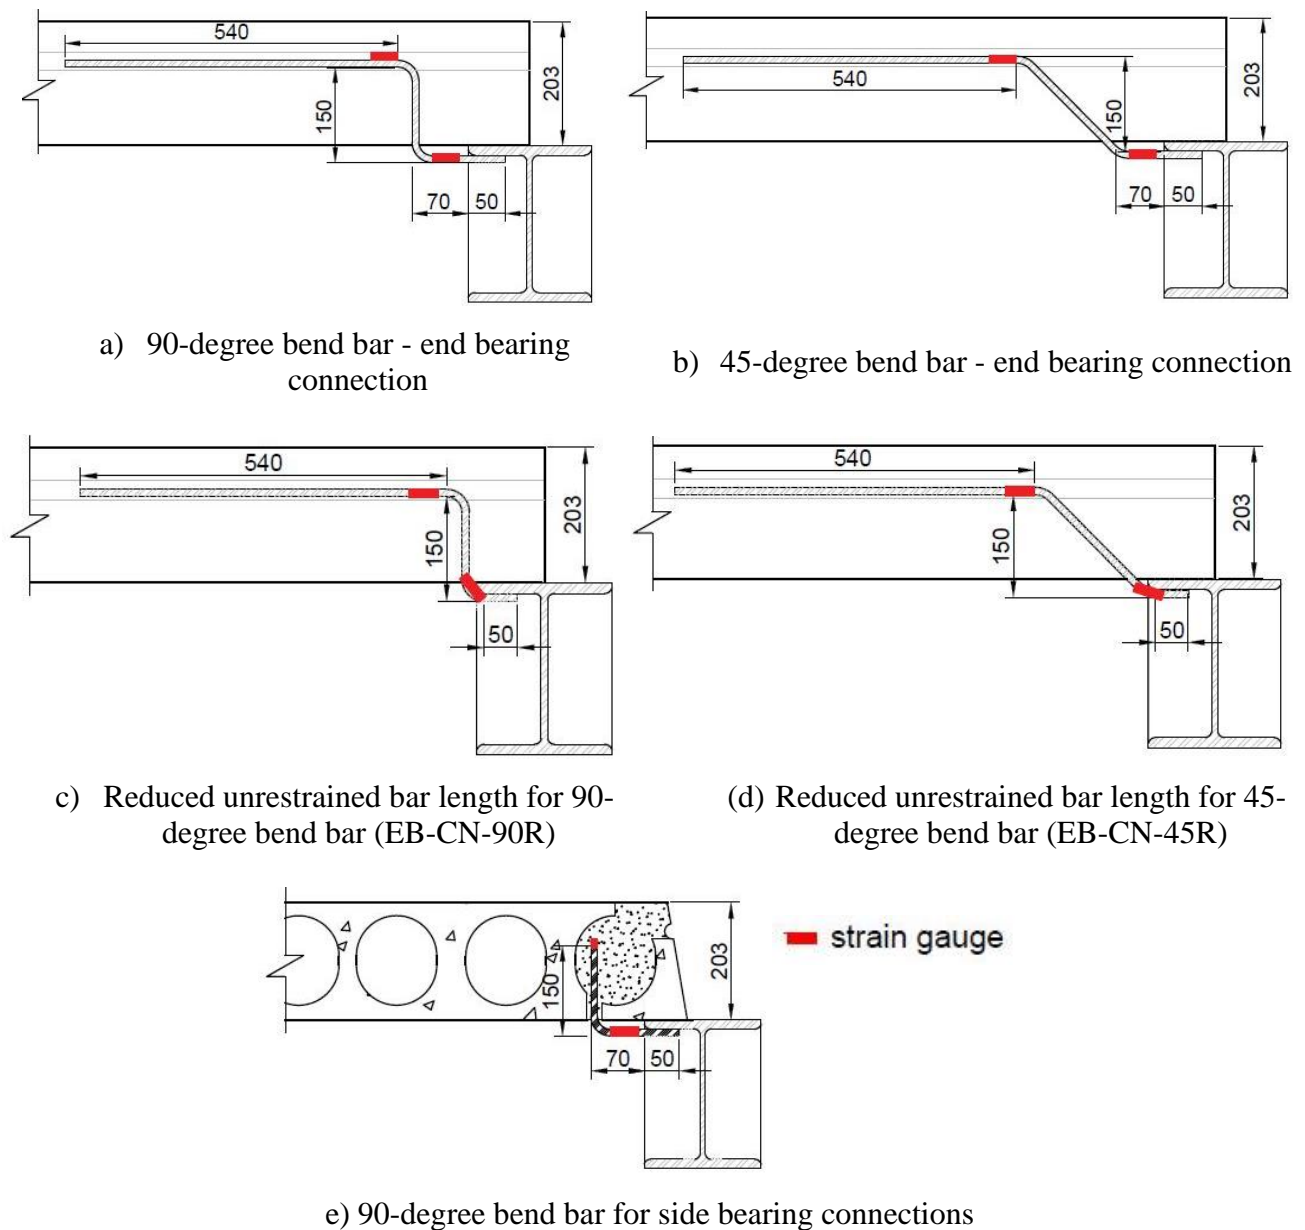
Steel bar connection detailing and locations of strain gauges (all dimensions in mm).
